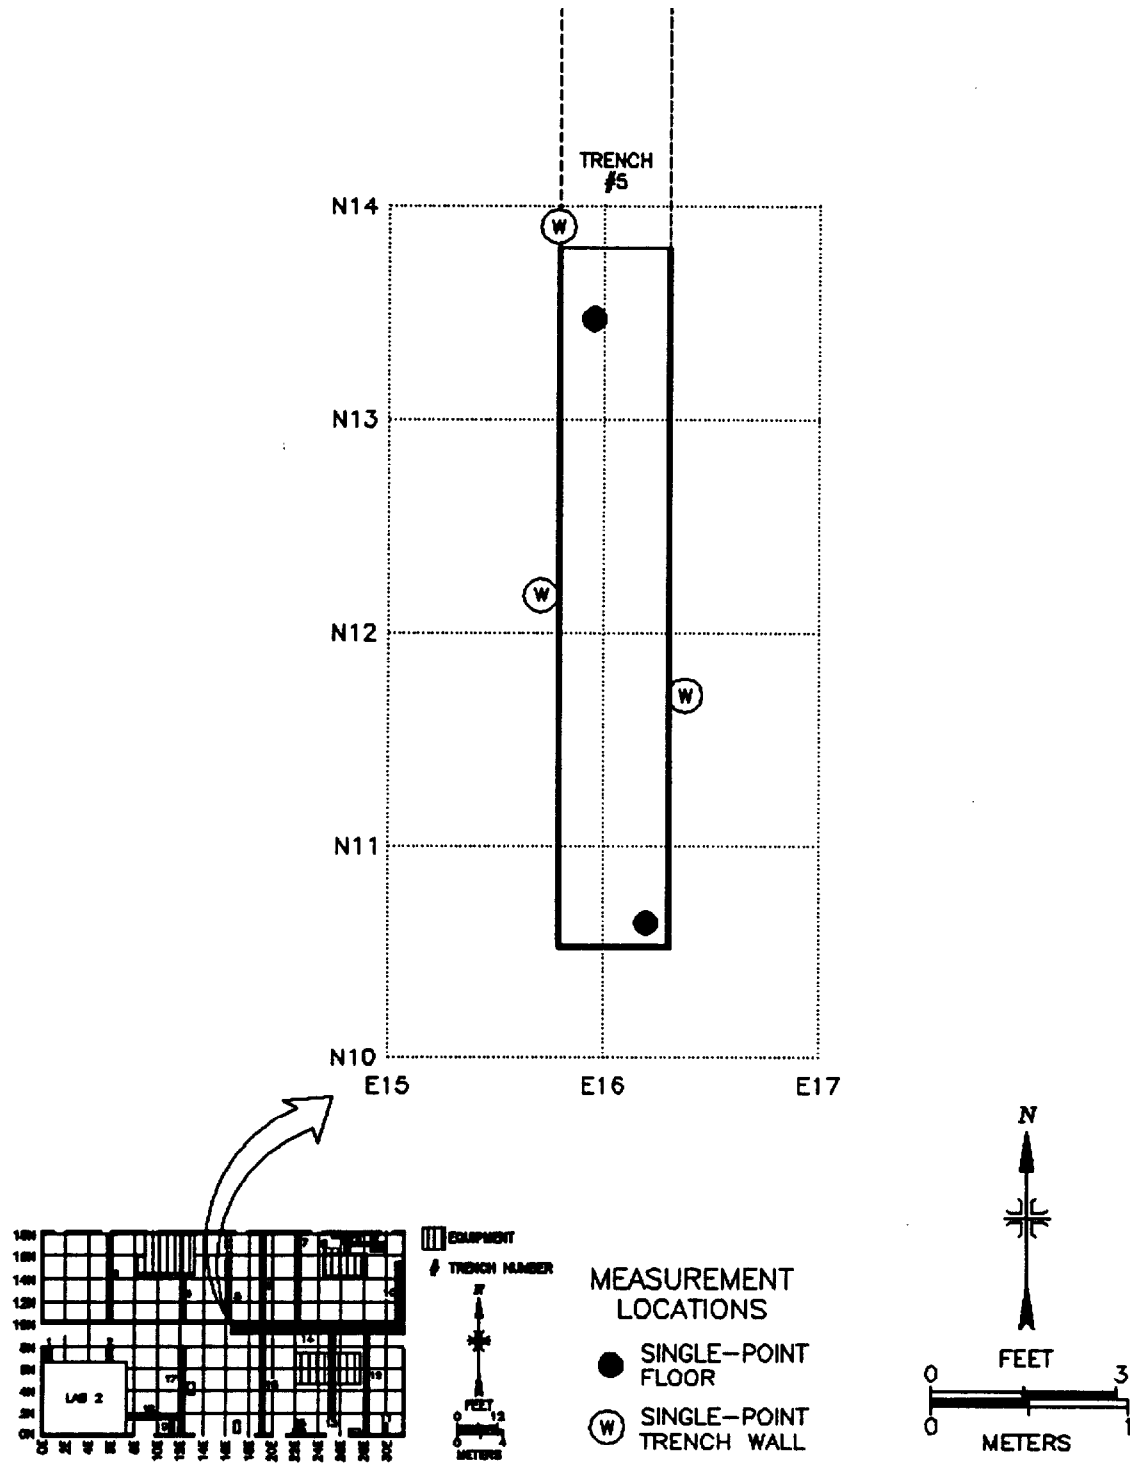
Building 23, Lab 1, Trench #5 – Measurement Locations
